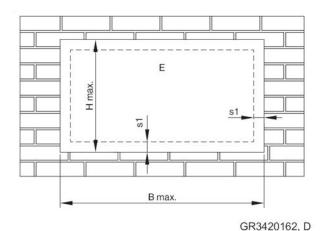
Fire batt – installation in solid walls and ceiling slabs, lightweight partition, timber stud wall, half-timbered construction and solid wood walls
